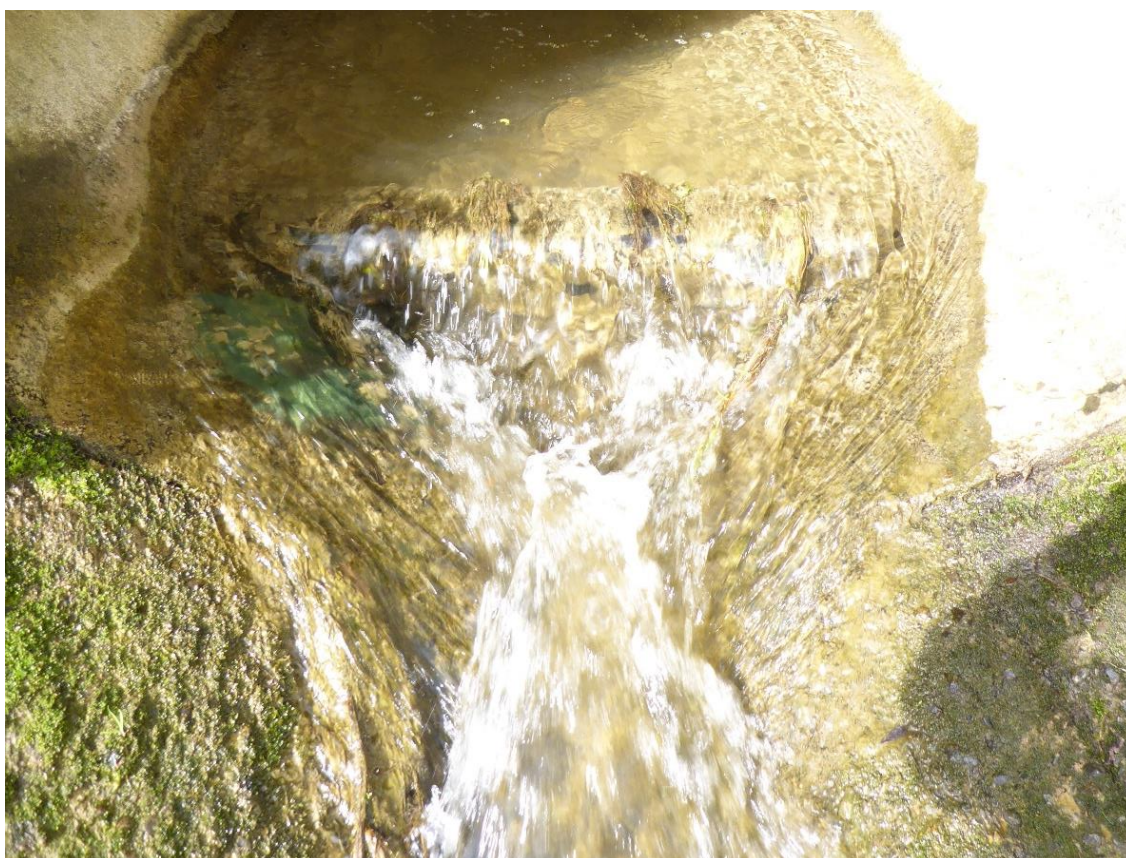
Weir created by the baffle at the transition point between the culvert outlet and apron.
